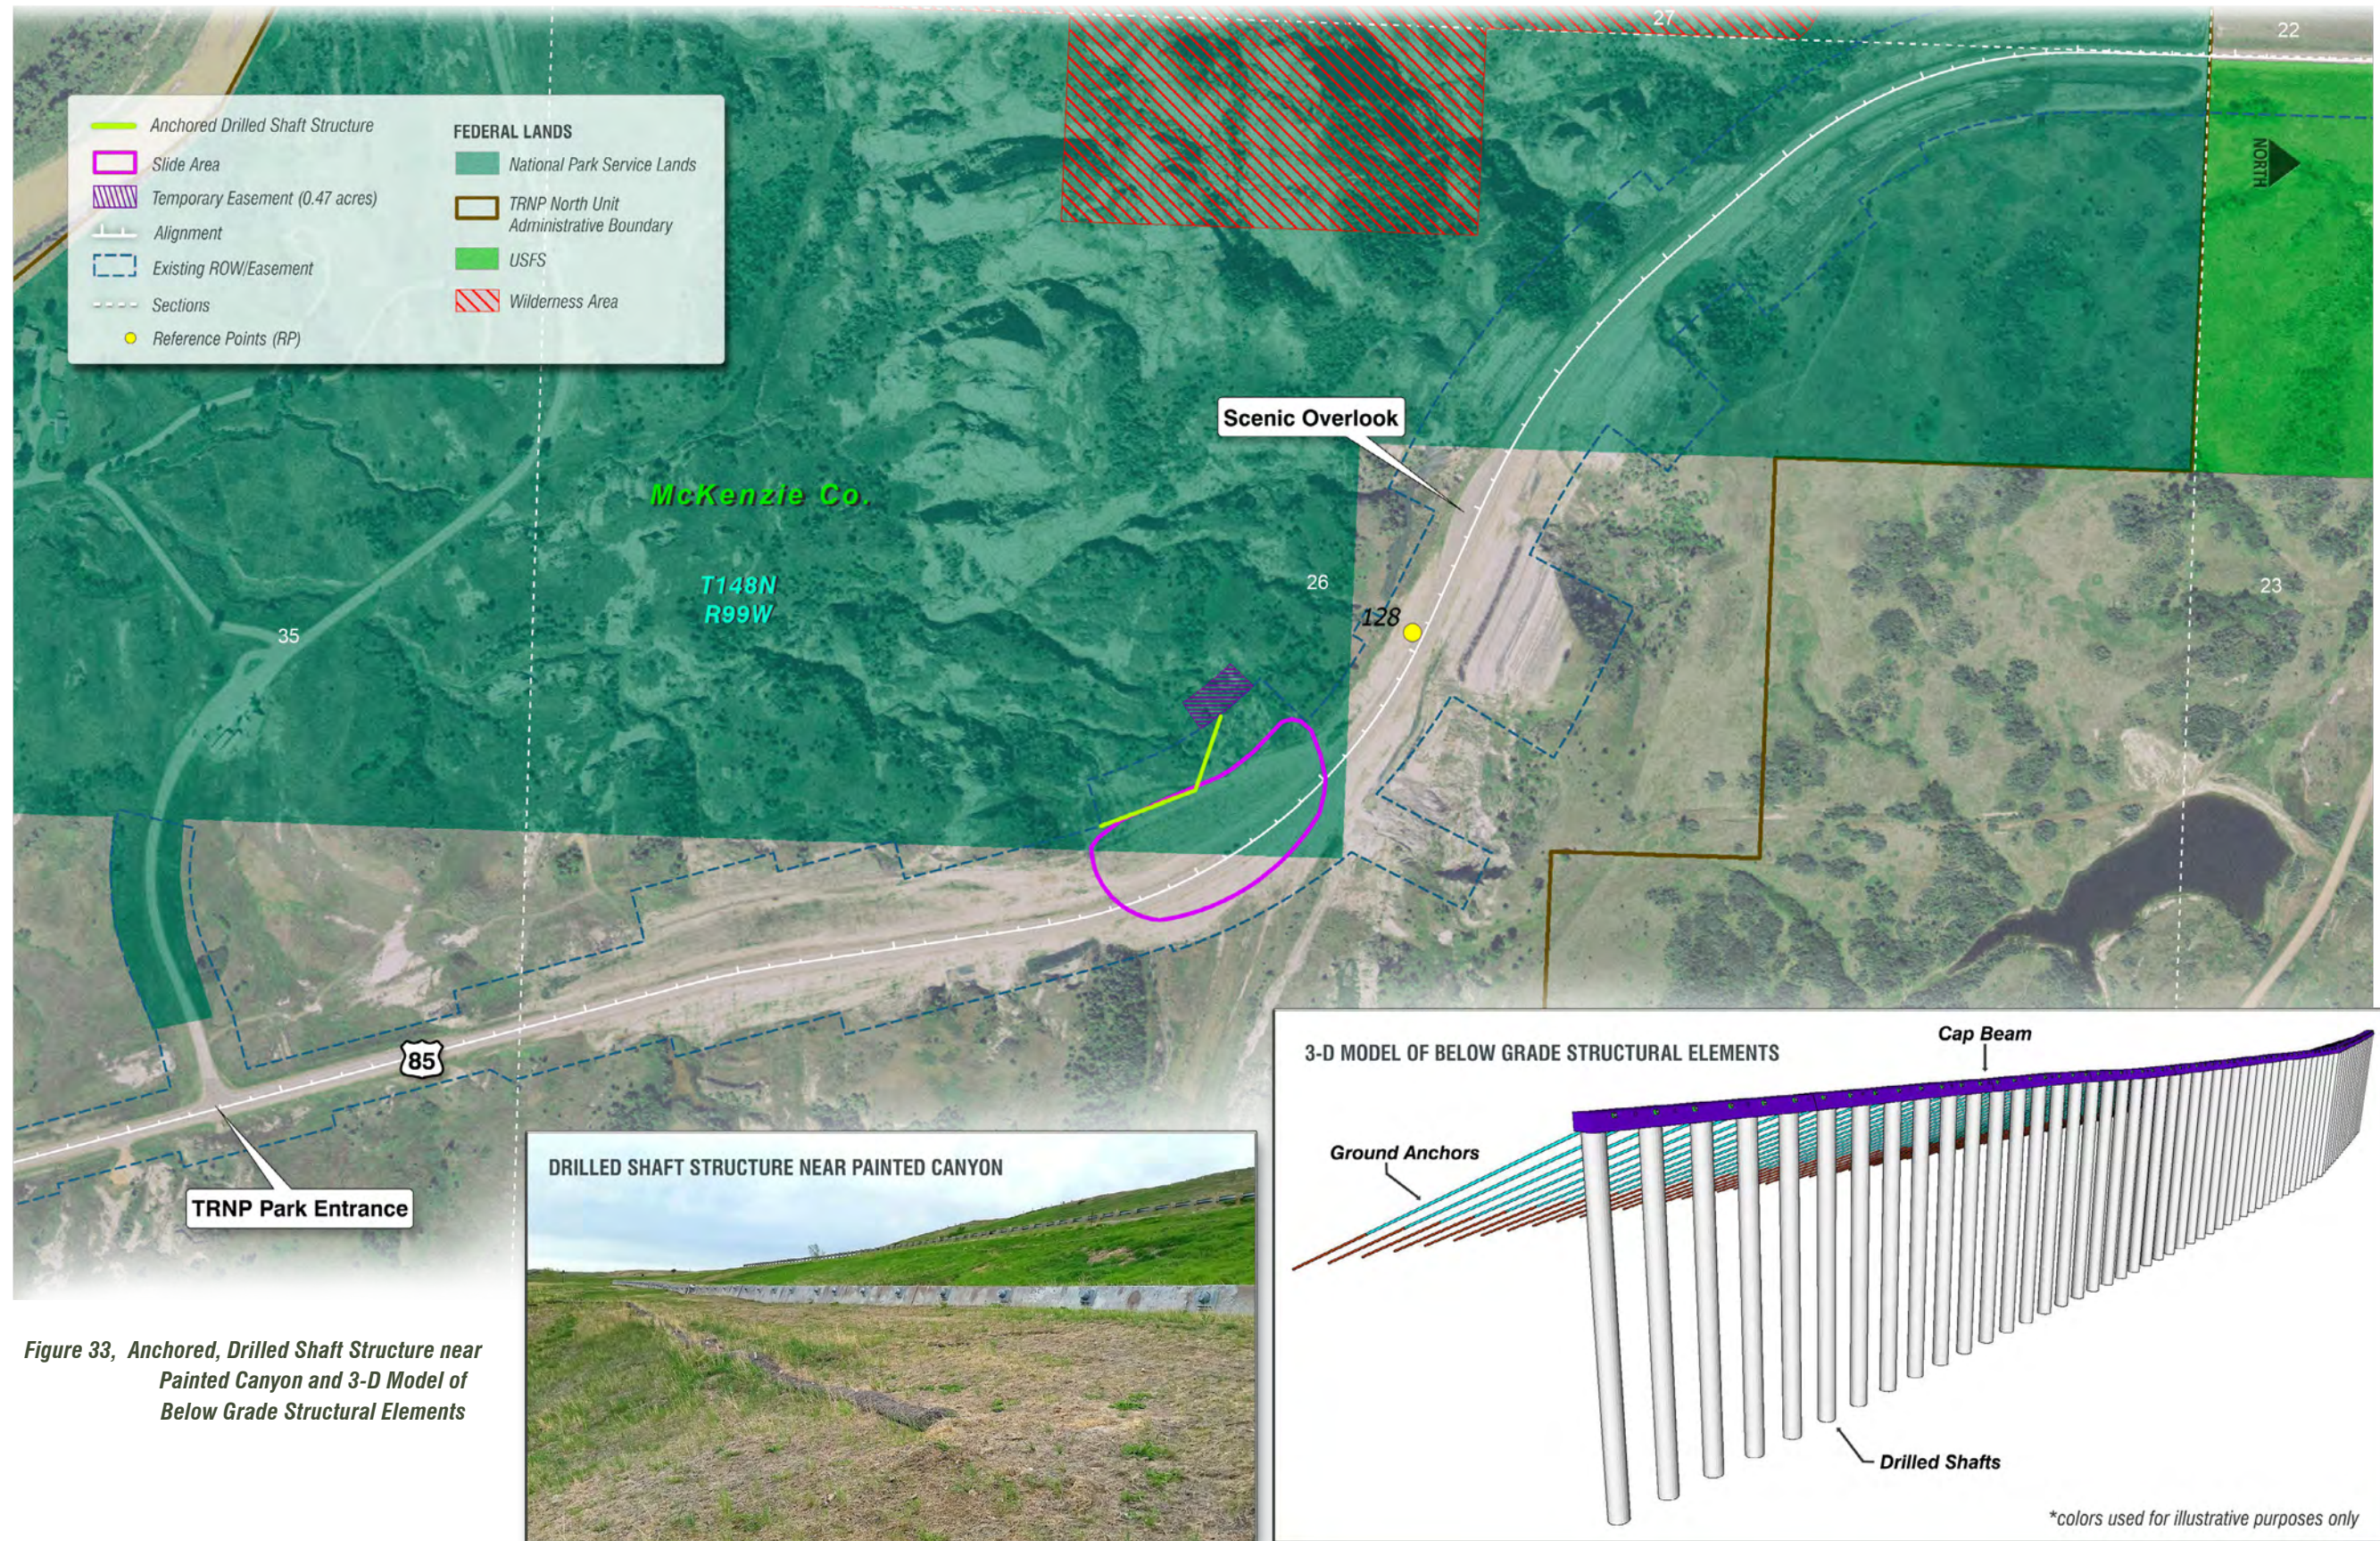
, Anchored, Drilled Shaft Structure near Painted Canyon and 3-D Model of Below Grade Structural Elements
